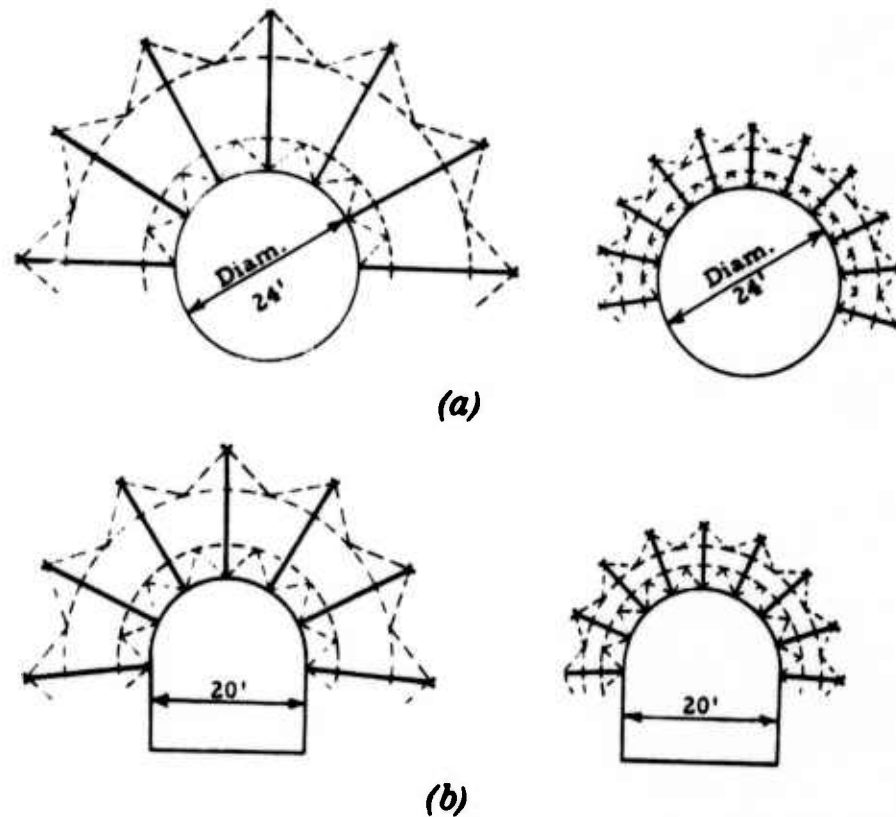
TYPICAL PATTERN FOR ROCK BOLTS. A) TOP, SHOWS THE BOLT PATTERN FOR A CIRCULAR TUNNEL. THE SEVEN BOLTS SHOWN IN THE LEFT-HAND DRAWING WERE EACH 20 FT LONG, SPACED 6 X 6 FT. THE 11 BOLTS IN THE RIGHT-HAND DRAWING WERE EACH 8 FT LONG, SPACED 4 X 4 FT. B) BOTTOM, SHOWS ROCK BOLT PATTERN FOR A HORSESHOE TUNNEL. THE SEVEN BOLTS IN THE LEFT-HAND DRAWING WERE EACH 16 FT LONG, SPACED 5-1/2 X 5-1/2 FT. THE NINE BOLTS IN THE RIGHT-HAND DRAWING WERE EACH 8 FT LONG, SPACED 4 X 4 FT (AFTER LANG, 1961)
